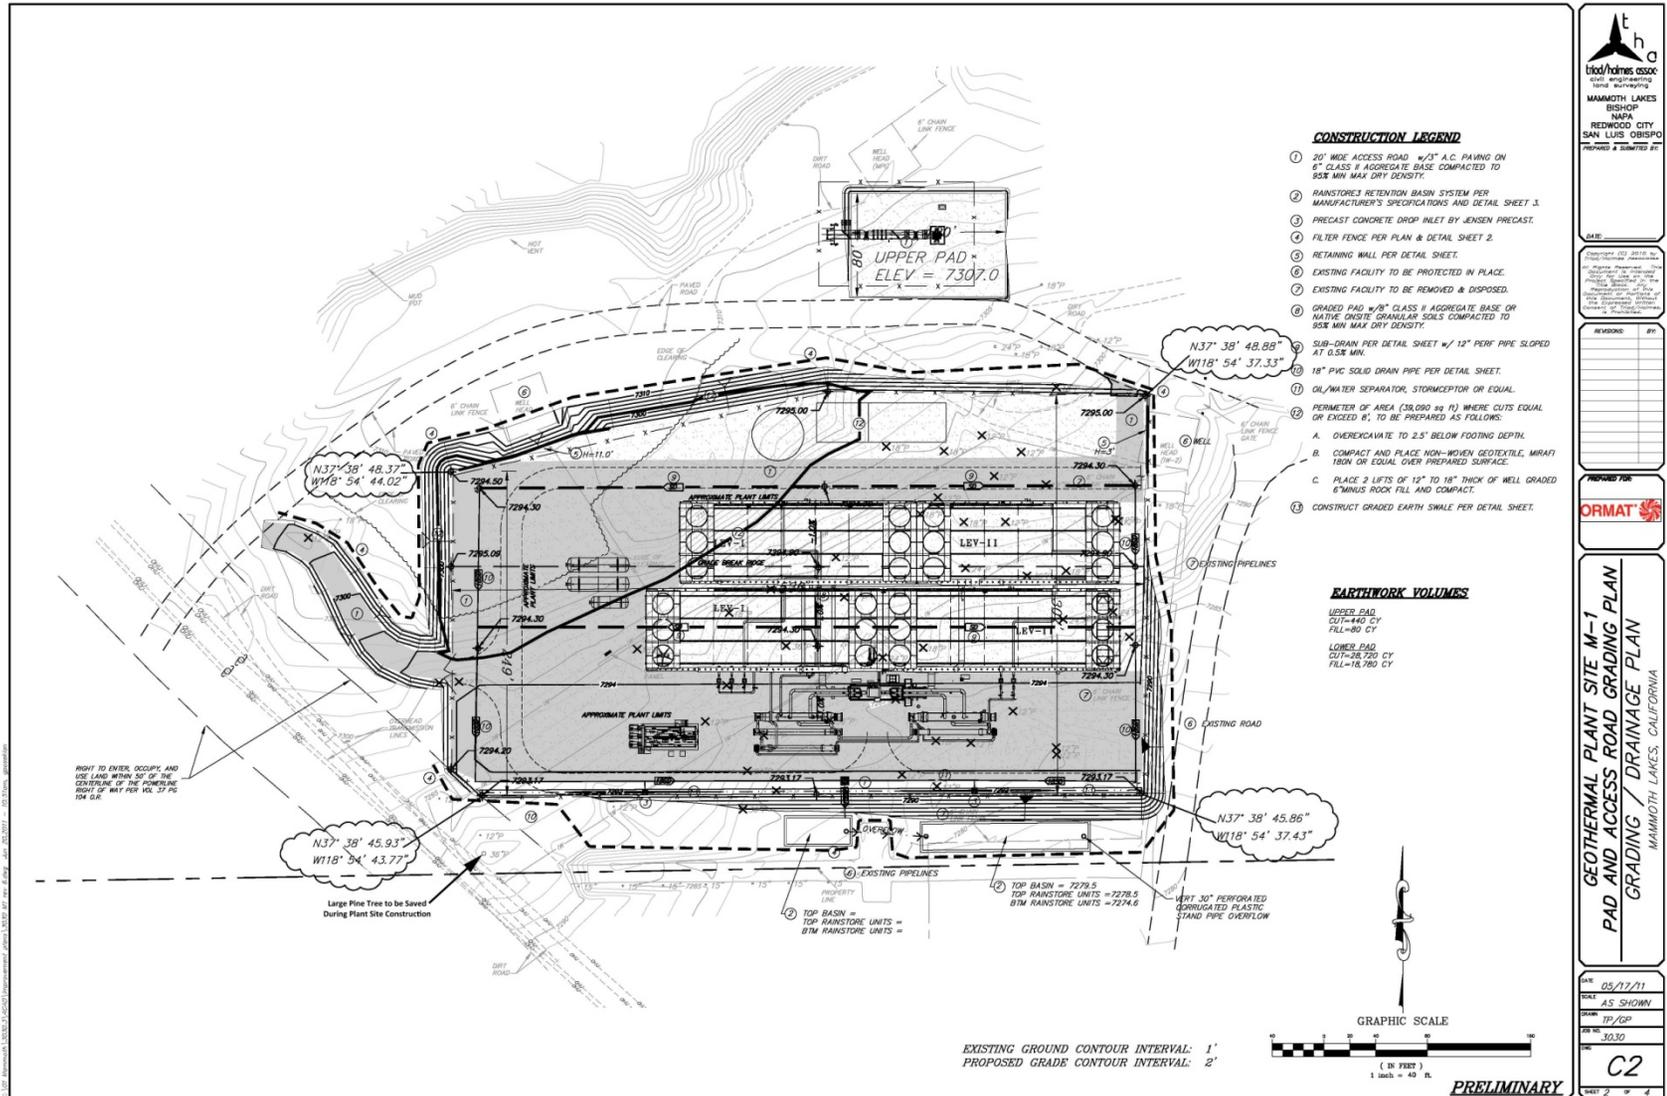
Preliminary Proposed M-1 Plant Site Grading/Drainage Plan
